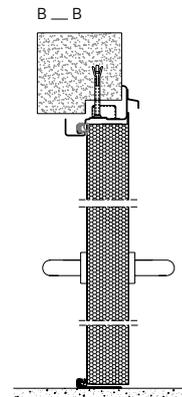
Vertical cross-section of the ECO double-leaf steel seamless door with a corner frame without a thermal break
